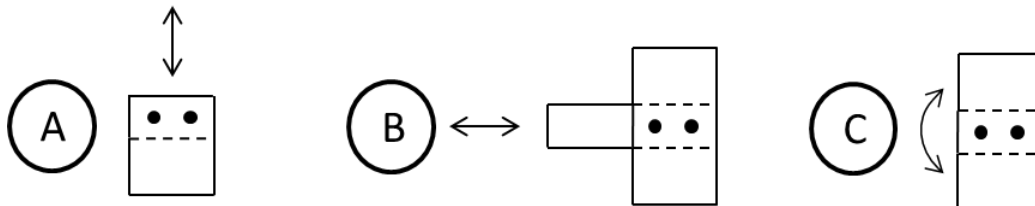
Specification of test specimens: A – loading perpendicular to joist, B – loading parallel to joist, C – loading in torsion
